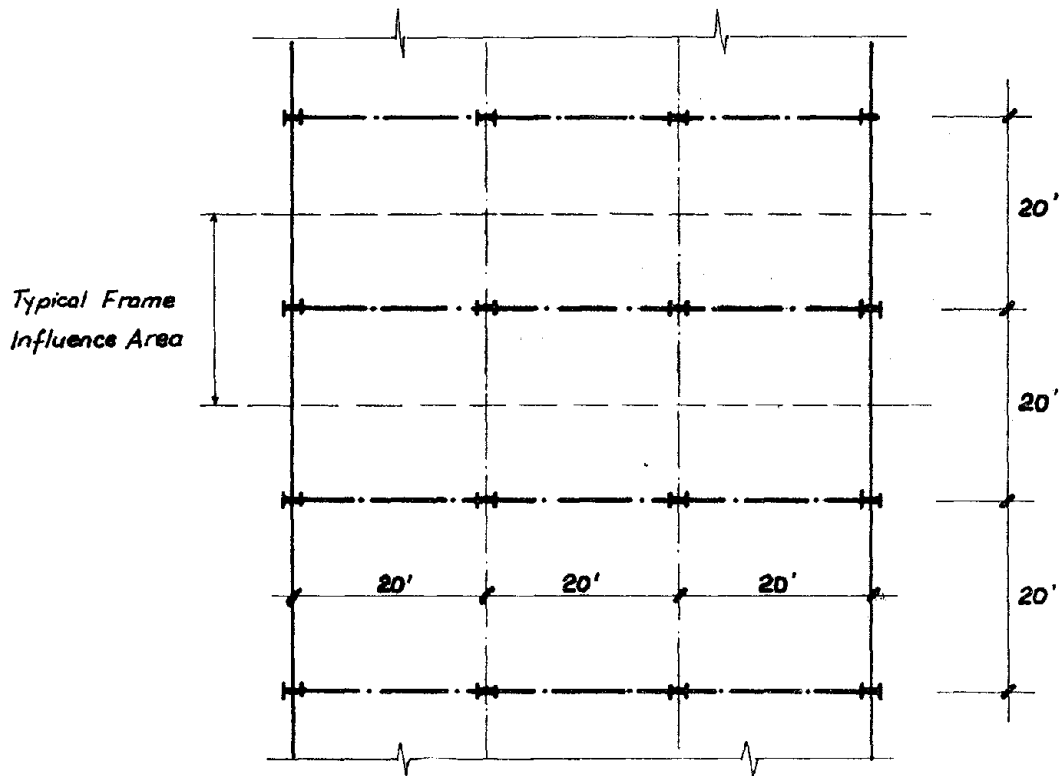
PLAN 10-STORY BUILDING BY UBC AND 16- STORY BUILDING
